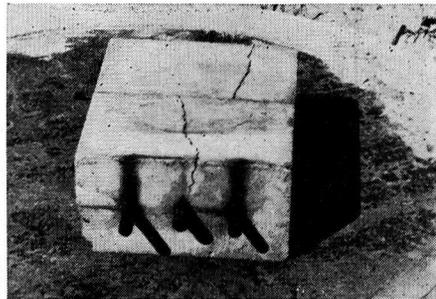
Splitting of Concrete Block Due to Rusting of Embedded Bars
